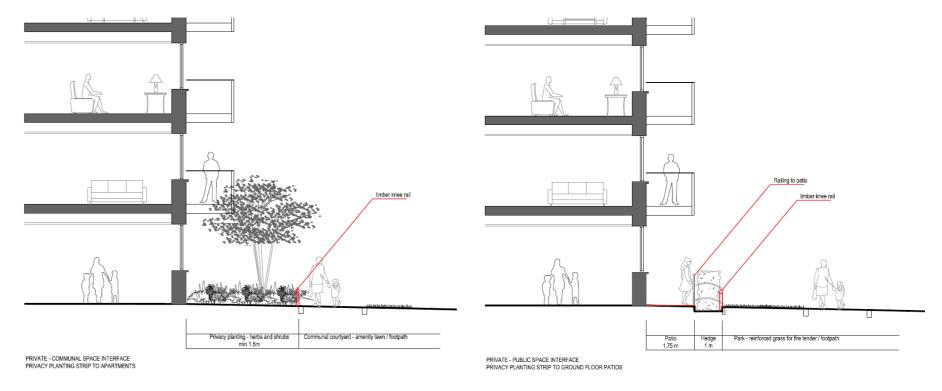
Building sections showing defensible space - balancing privacy sociability and passive surveillance through privacy planting strip
